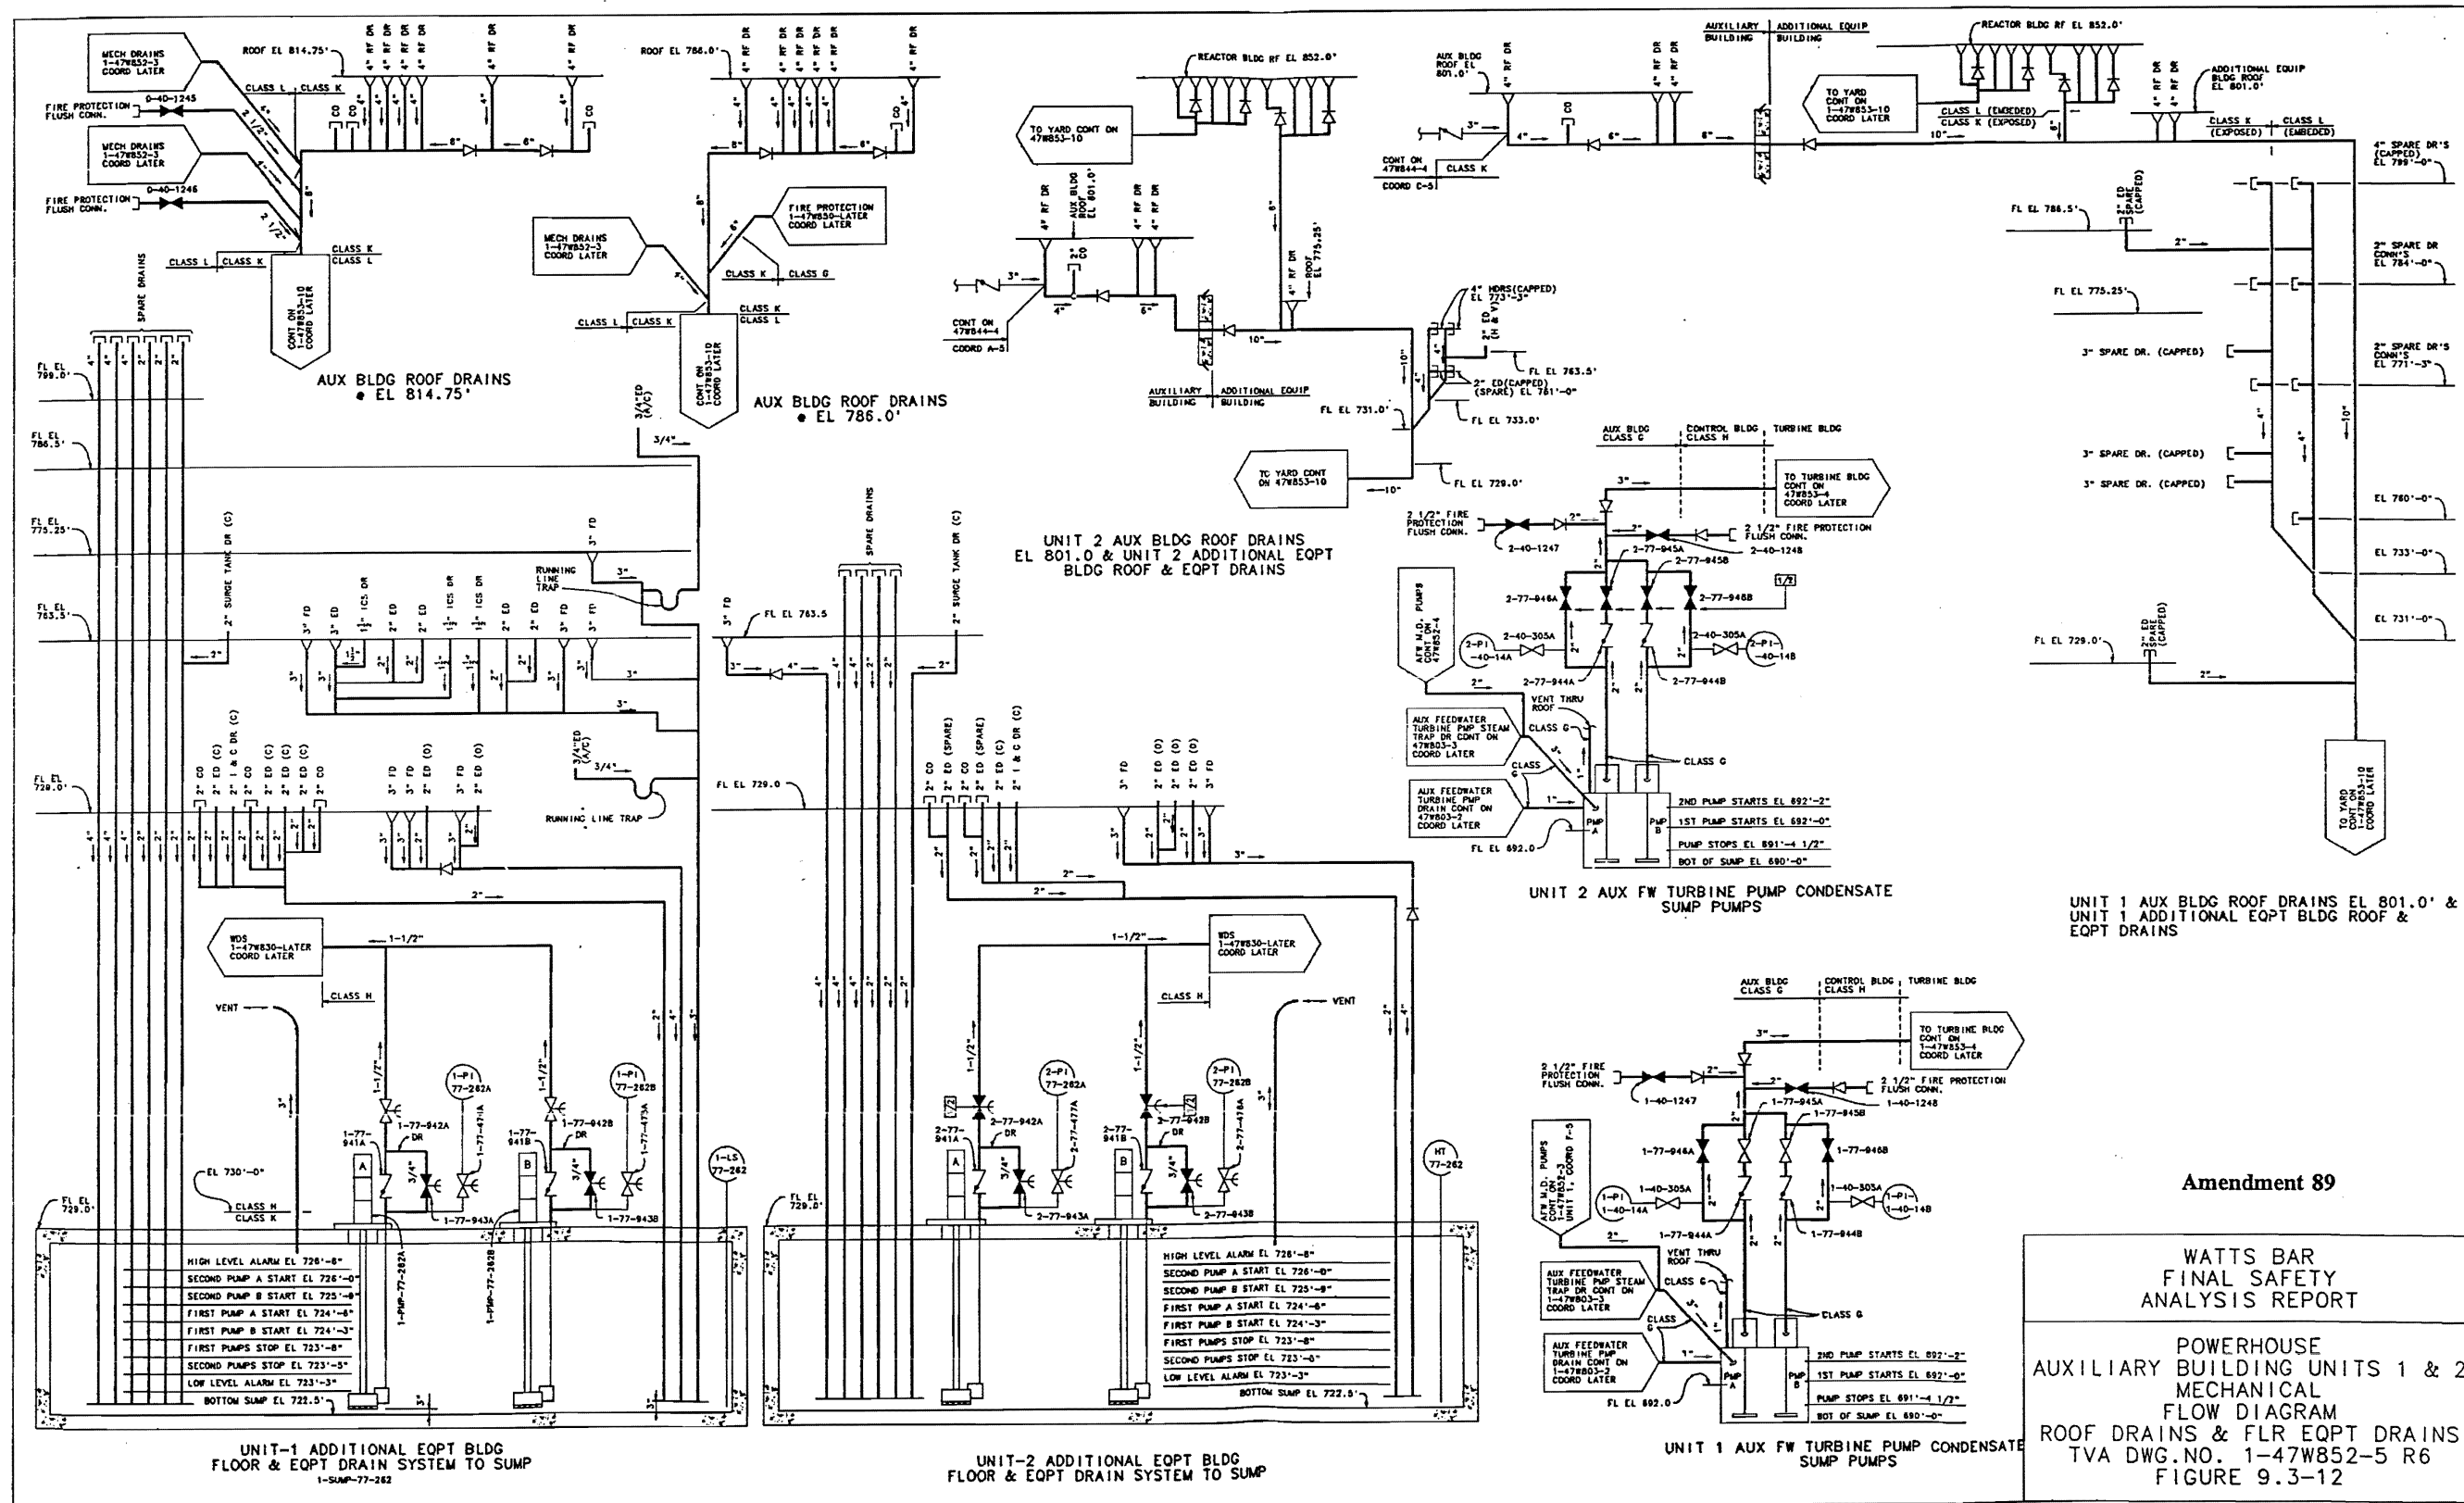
Powerhouse, Auxiliary Buildings Unit 1 & 2 Mechanical Flow Diagram Roof Drains and Floor Equipment Drains
